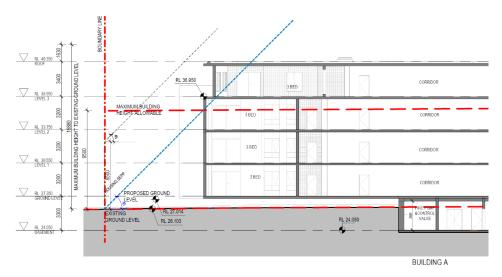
Section of Building A showing Housing SEPP building envelope plane in blue from Troy Street side boundary (Source: Group GSA)
